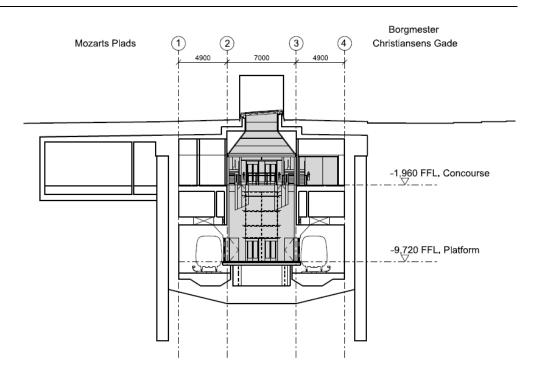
Mozarts Plads, semi shallow station, Typical Cross Section
